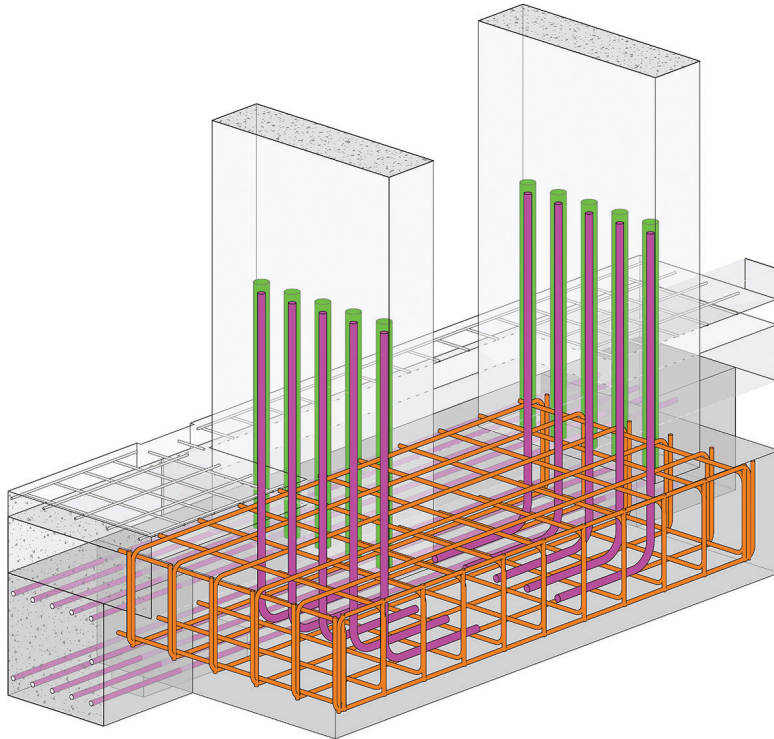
Detail of a BIM model describing precast concrete connections and reinforcing.
